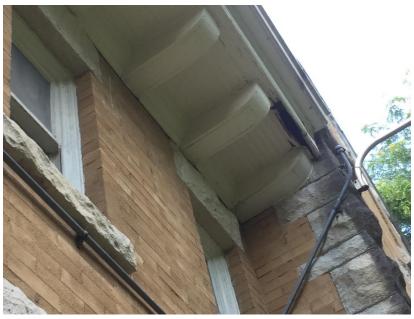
Opening in soffit at the east side of the gable on the north facade.
